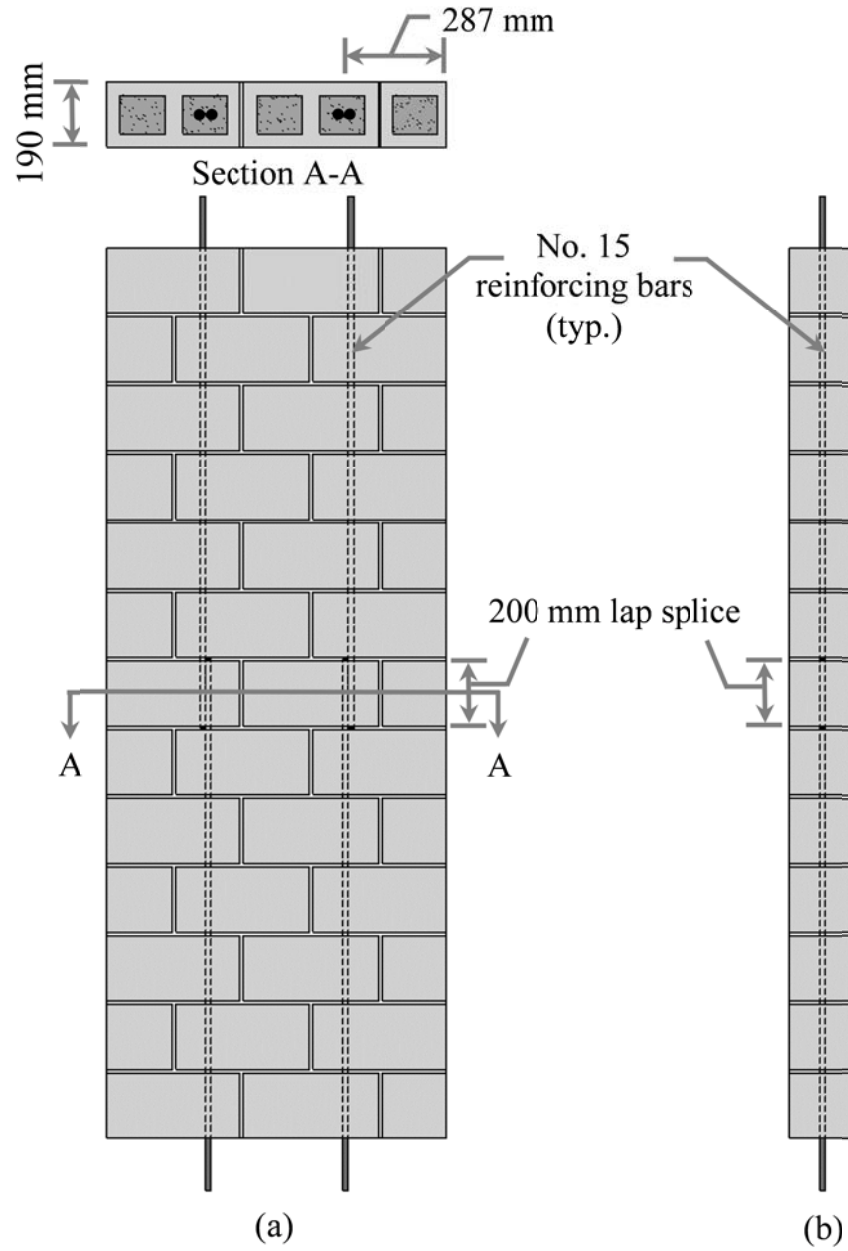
Control Wall Splice Specimen with Contact Lap Splices (CLS): (a) Elevation Including a Section at Splice Level, and (b) Side Profile.
